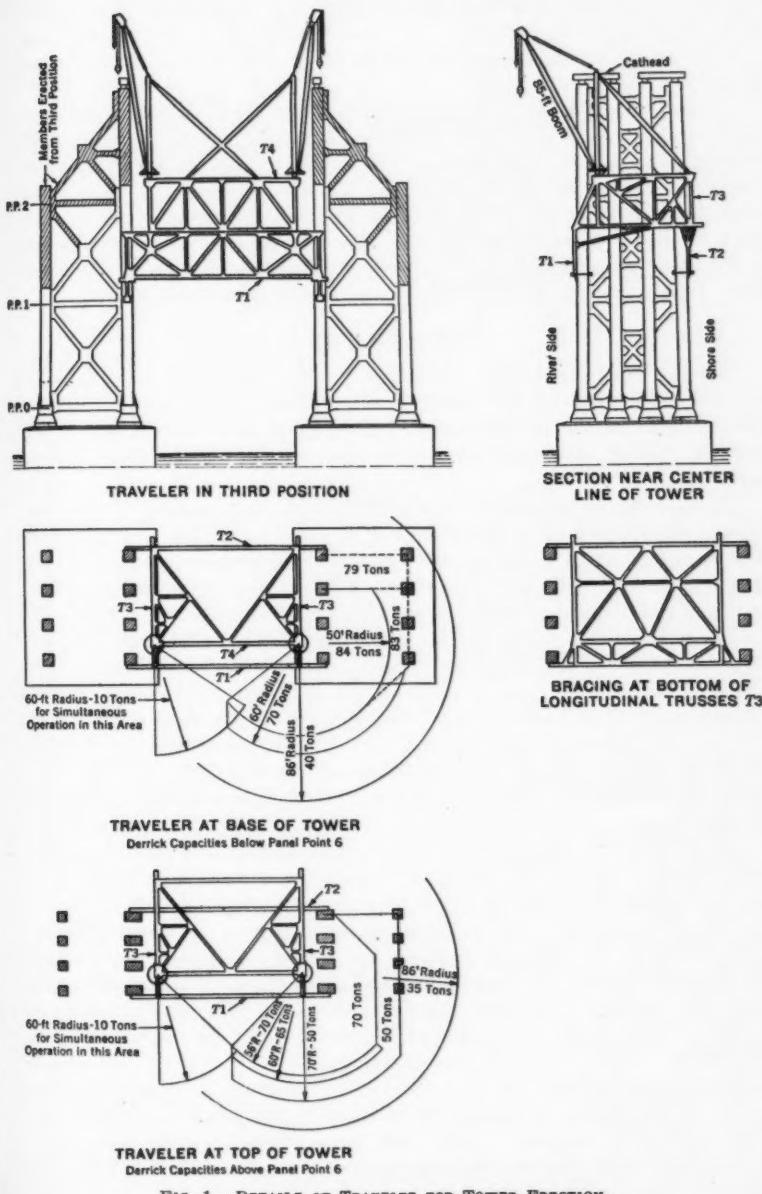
DETAILS OF TRAVELER FOR TOWER ERECTION.
